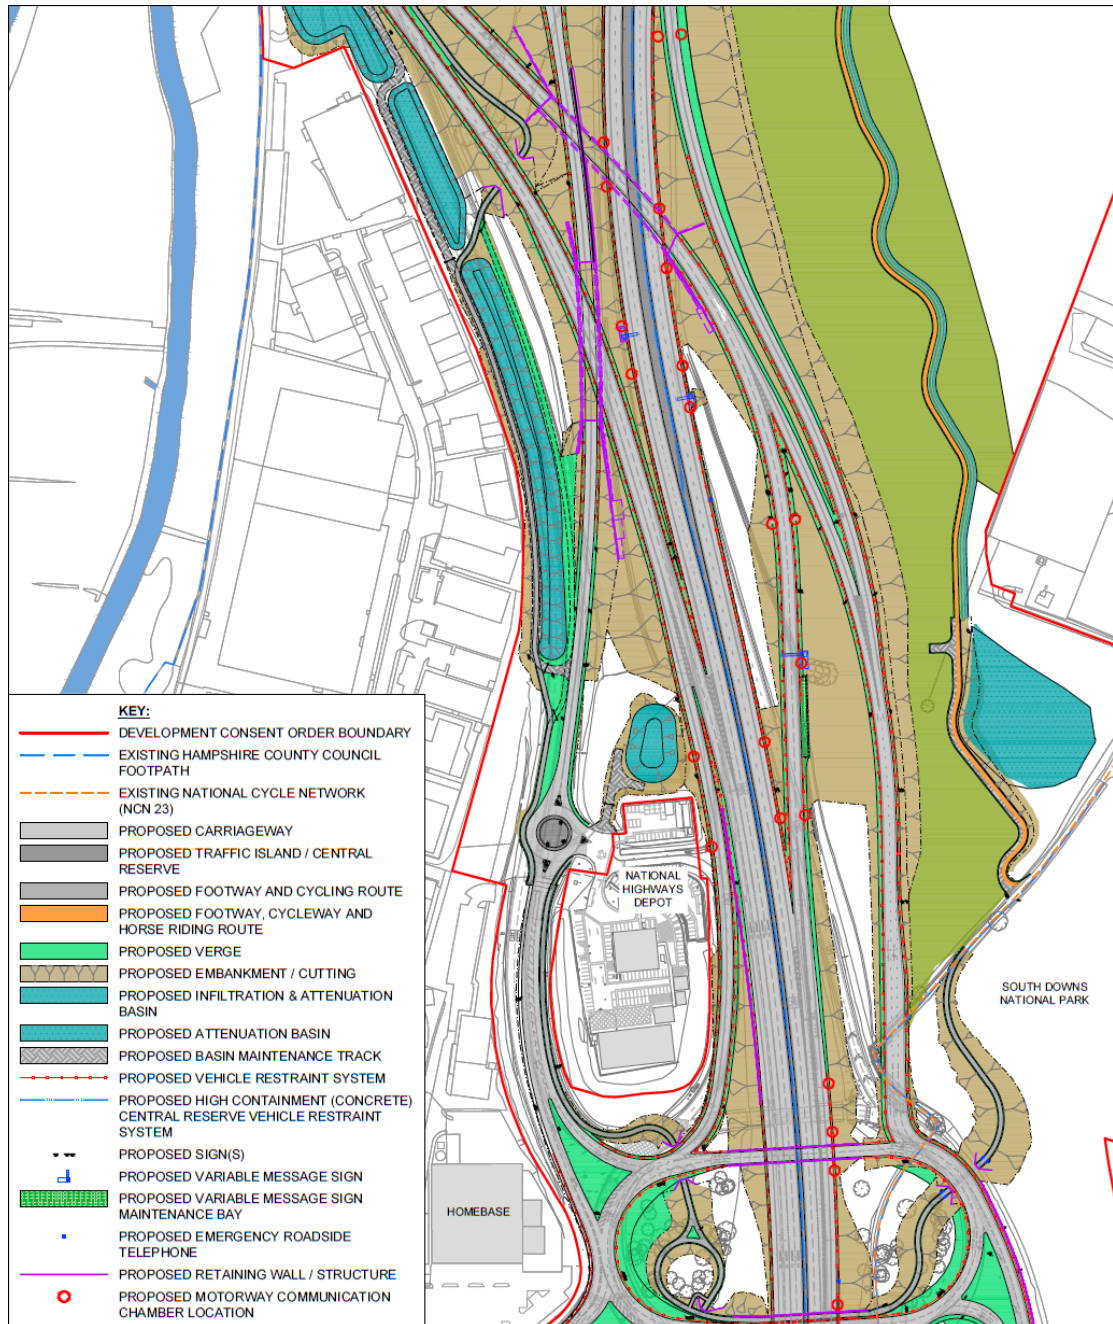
M3 North Arrangement – Extract from General Arrangement drawing
